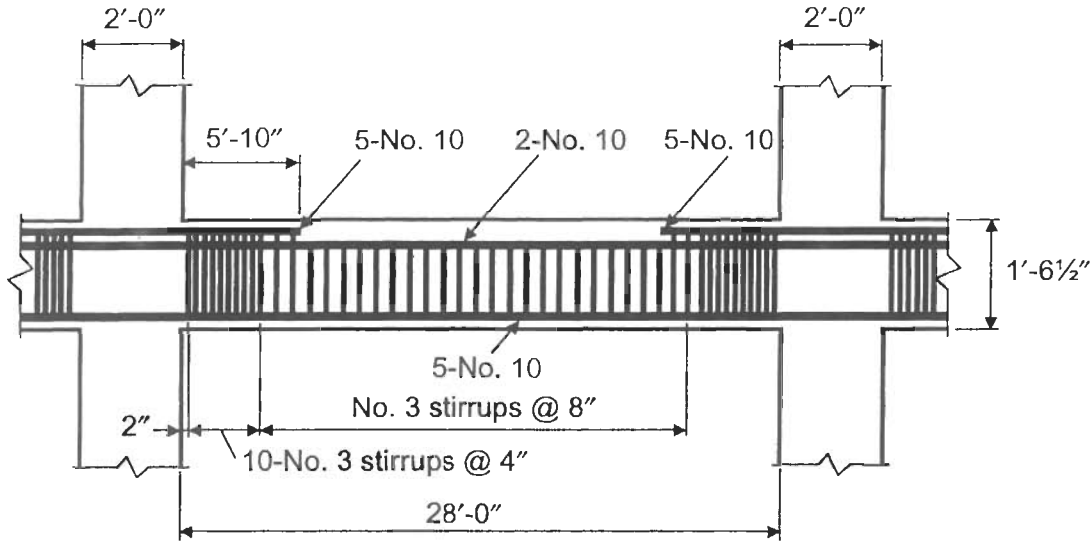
Reinforcement Details for Beam B3-C3 at Floor Level 1 (SDC C)
